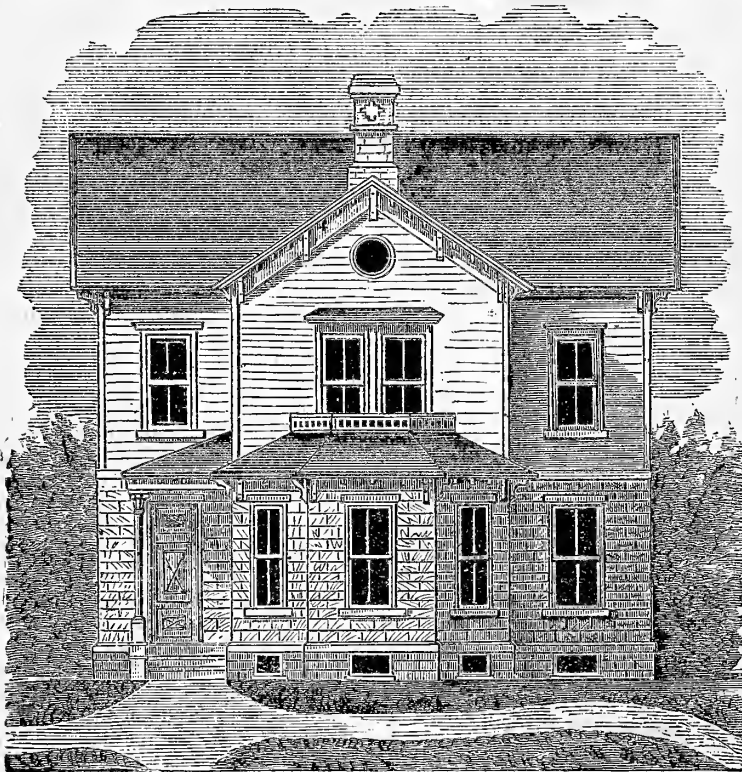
FRONT ELEVATION OF THE HOUSE.
